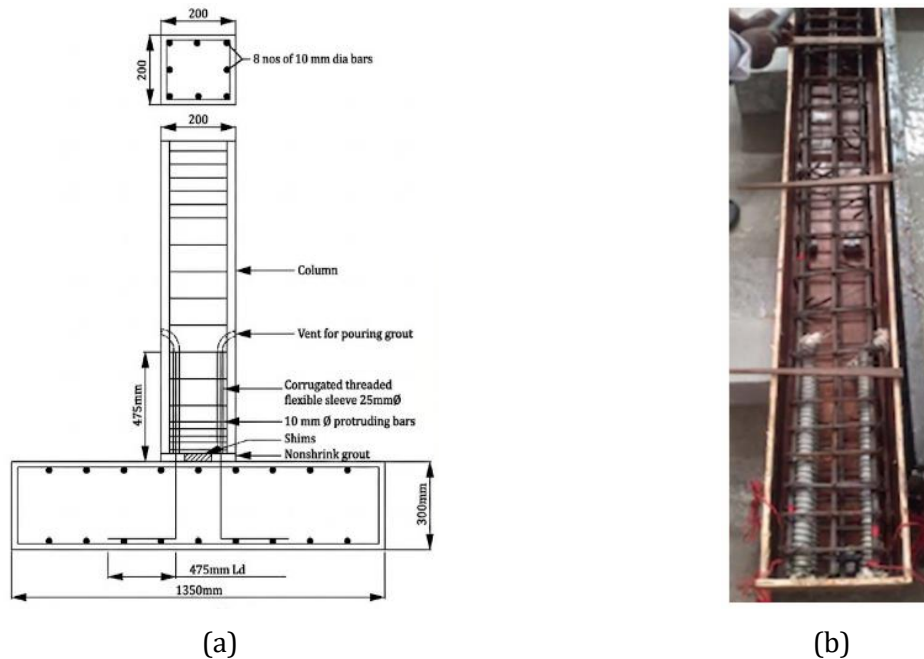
Reinforcement details of grouted sleeve specimen (GS)
